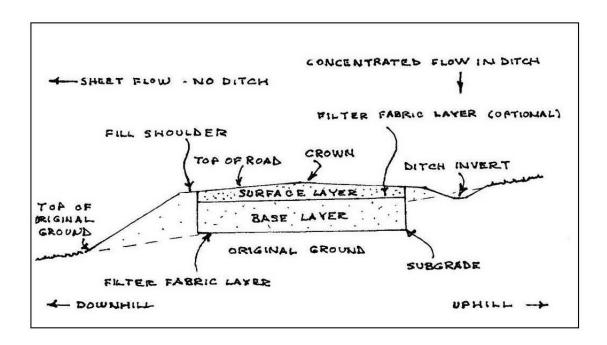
Typical Road Cross-Section - Canaan, NH Highway Department
